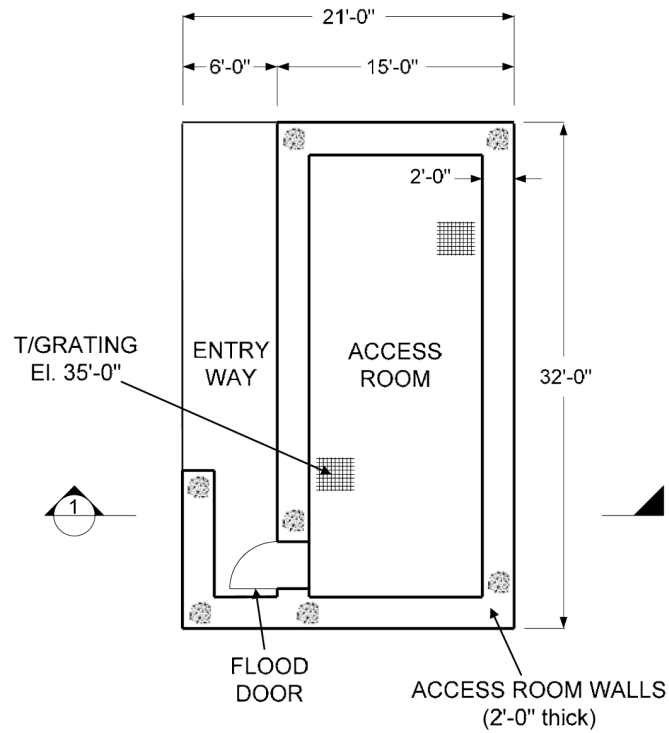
H.6-251 Plan View of DGFOSV at Elevation 35'-0"
